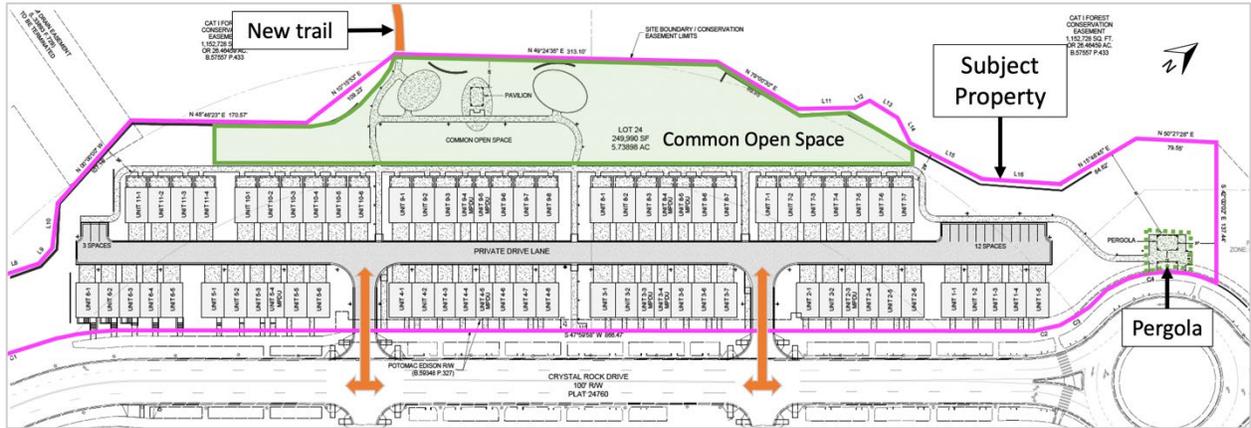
Subject Property and proposed Site Plan with 69 townhouse units, common open space, and natural surface trail into Black Hill Regional Park
